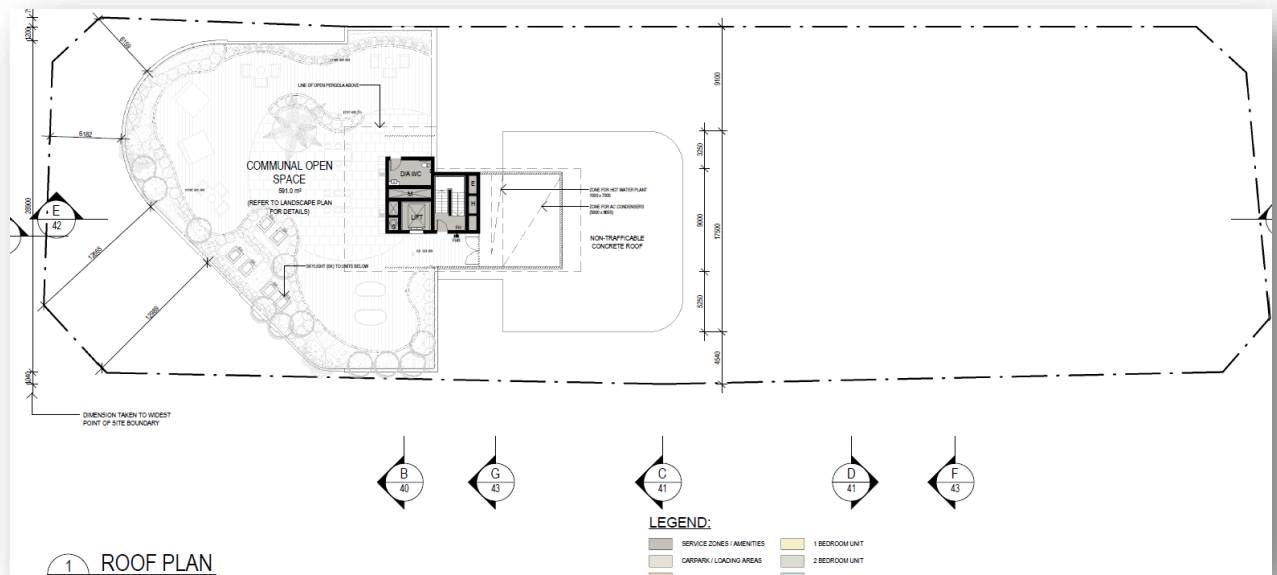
Roof Plan above Level 6 Including Communal Open Space
